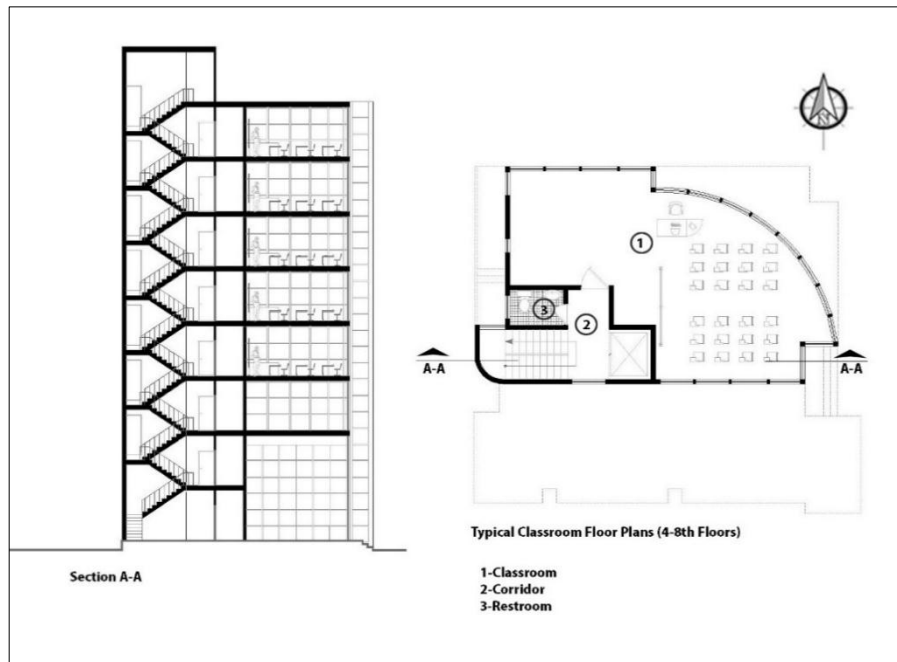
Schematic Section and Typical Classroom Plans (4-8th floors)–UMK
